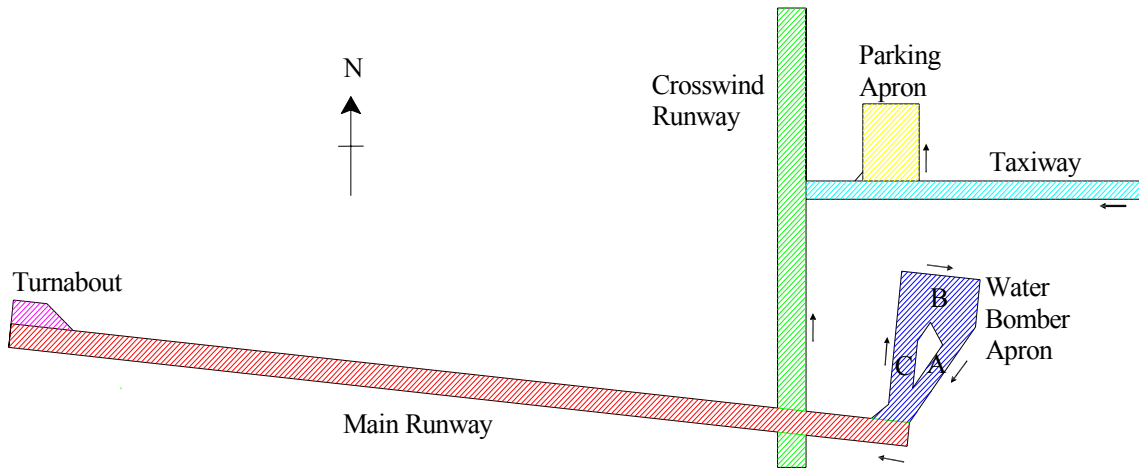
Meadow Lake Airfield Pavement Sections and Site Layout
